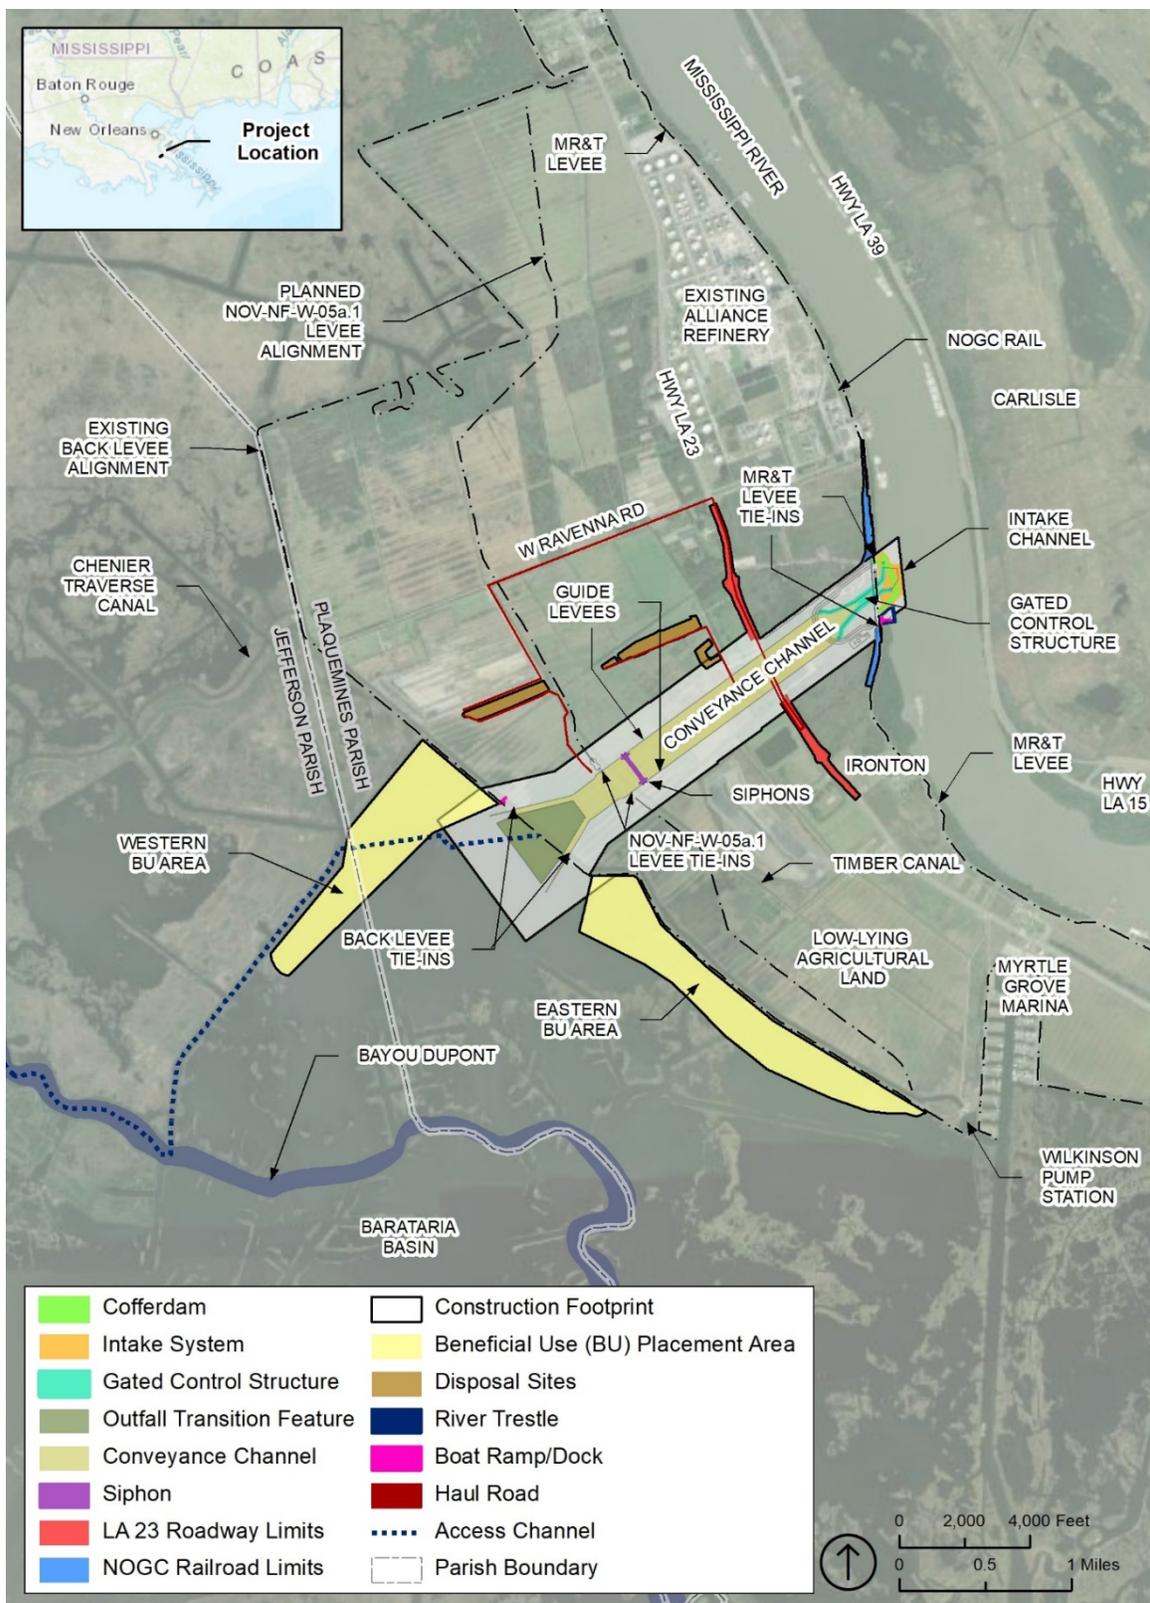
Design Features and Construction Footprint of the Proposed MBSD Project and Its Alternatives. NOGC = New Orleans and Gulf Coast Railway, NOV-NFL = New Orleans to Venice Non-Federal Levee.
